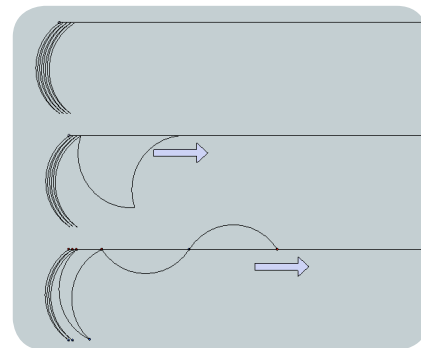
Plan view of the wall sections nested and then being pulled out to form the corrugations.
